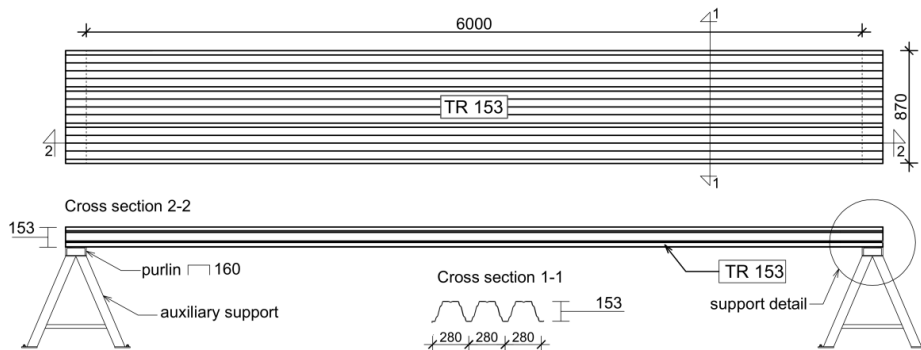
Setup, longitudinal and transversal cross-section of the test specimen, source: Authors
